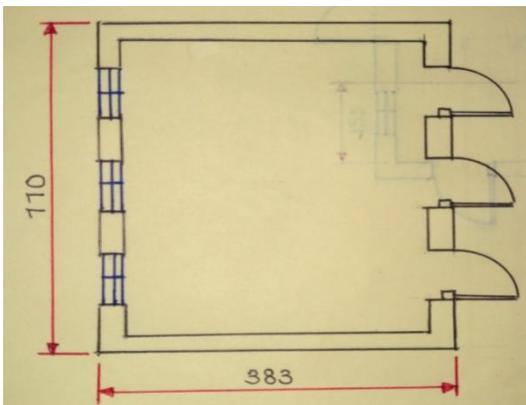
Plan view of the dining room in Pattivilla Walawwa (dimensions in cm)
